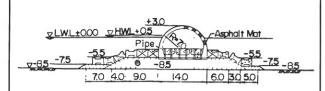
Cross-section of semi-circular caisson breakwater at Miyazaki Port, Japan (taken from Tanimoto et al. 1994).
